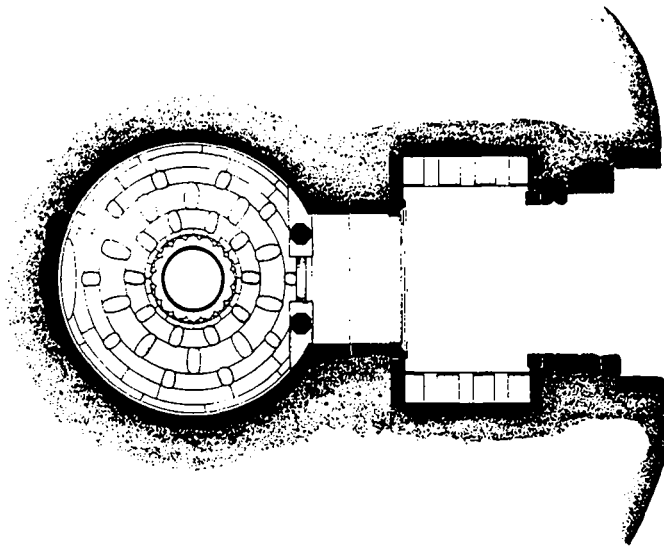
Sök-kul-am 石窟庵 석굴암: plan of the ceiling as reconstructed by Japanese officials in the early 20th C. AD (mid-8th C. AD, scale: 1 : 200) (after: EPFL (1992))
